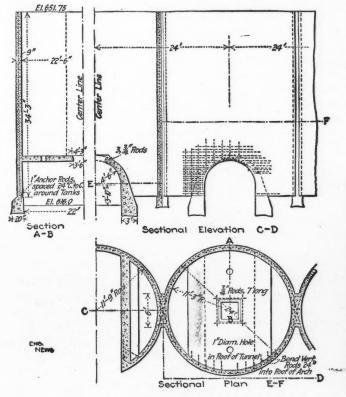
DETAILS OF CONSTRUCTION OF BINS, SHOWING REINFORCEMENT
